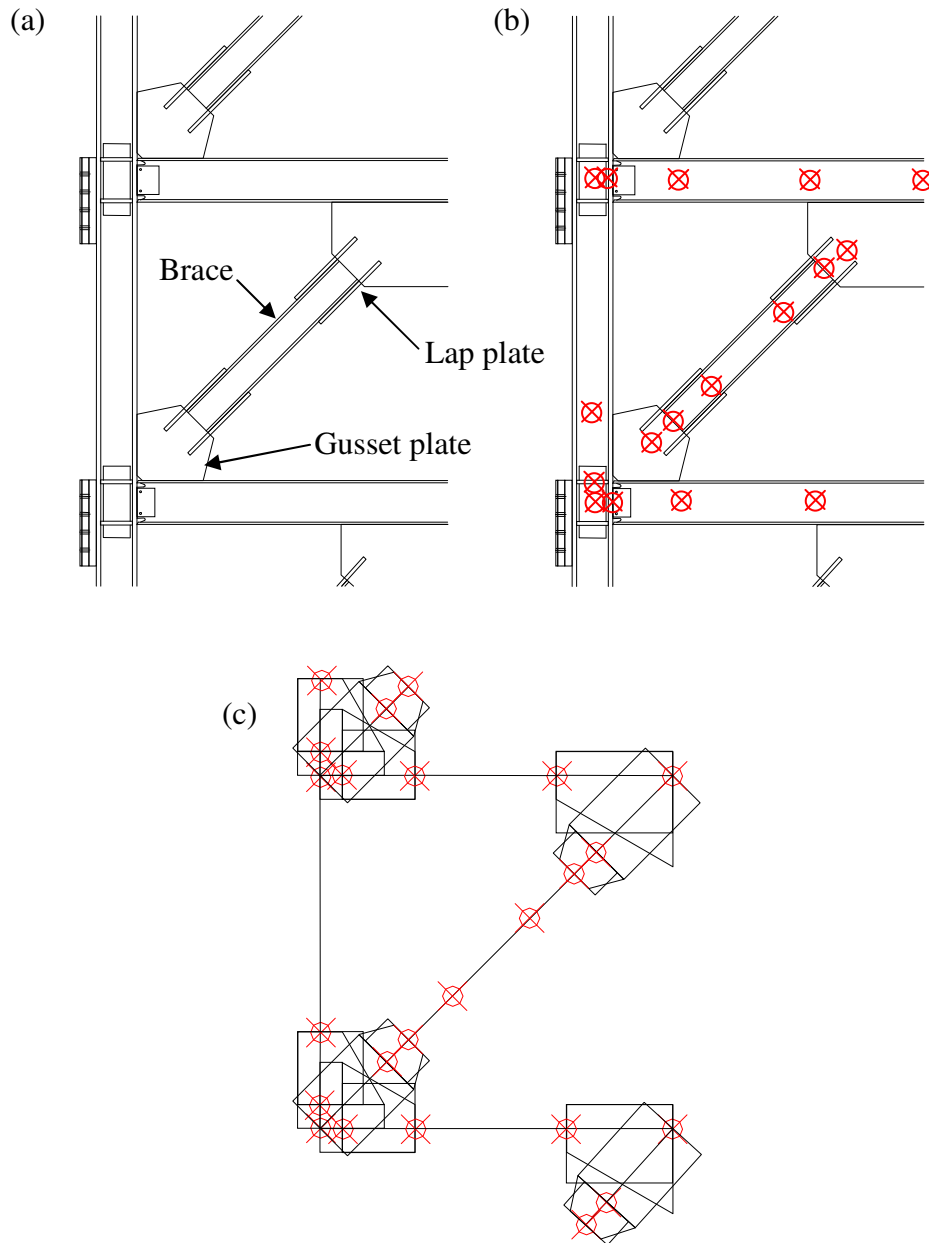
Typical brace connection at SC-CBF column: (a) drawing; (b) drawing with nodes indicated; (c) model
